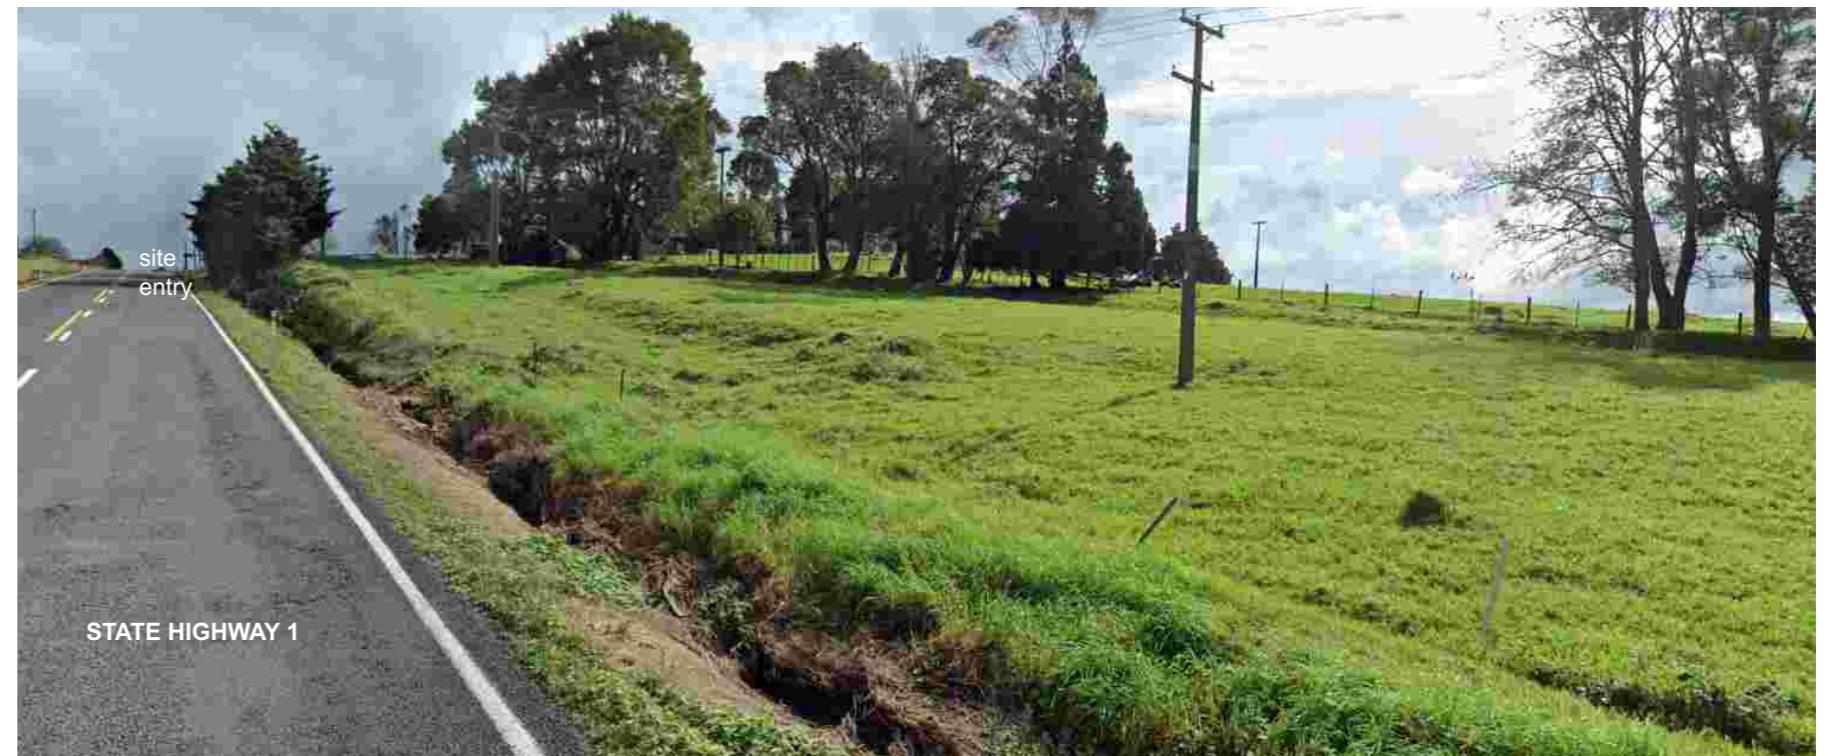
352 State Highway 1 Ohaeawai Rd. view from SH1 toward site.
